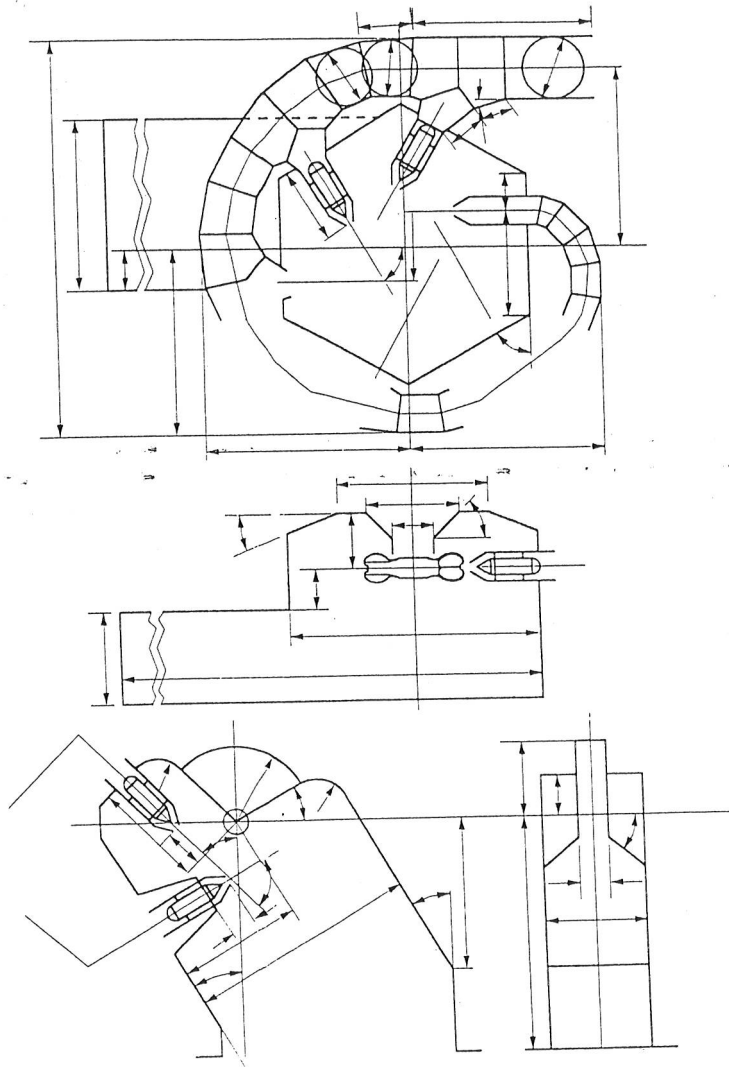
Pelton turbine: Example of dimensions to be checked on the distributor and the housing of vertical and horizontal shaft machines
